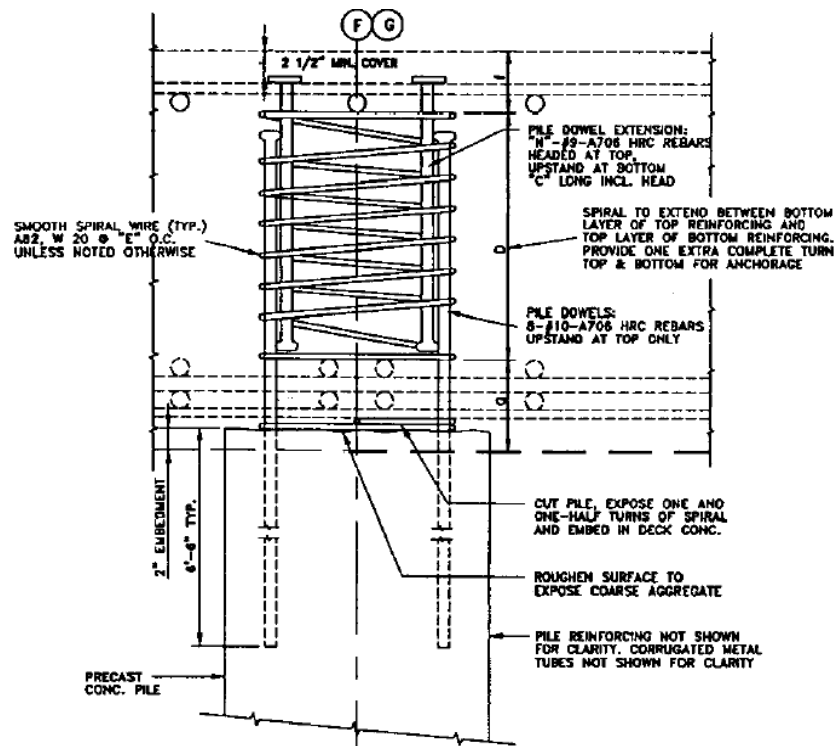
Typical prestressed concrete pile moment connections bond bar (Roder, 2002)
